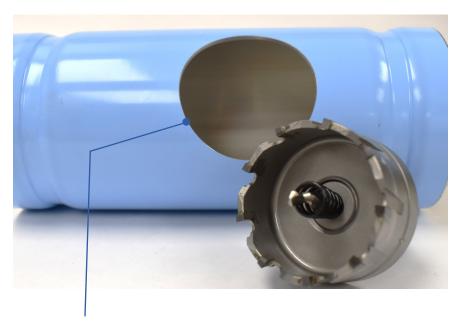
Clean the sealing surface of the tubing saddle clamp hole after drilling tubing.
